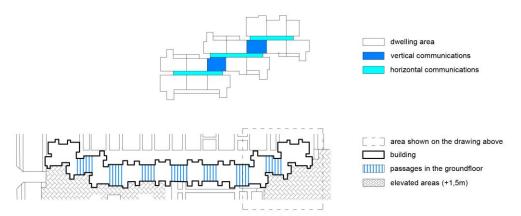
(a) building's typical floor scheme segment, and (b) nearby context surrounding the building in the Block 22; source: Authors
